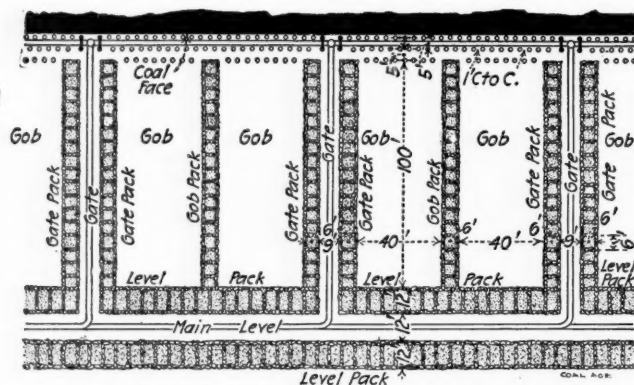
LONGWALL ADVANCING, SHOWING USE OF GOB AND ROADSIDE PACKS
